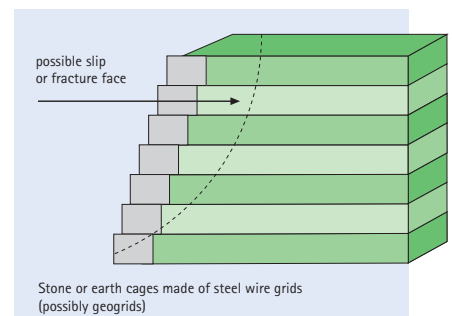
Structural shapes and slope inclines for the construction of synthetics-reinforced earth structures
